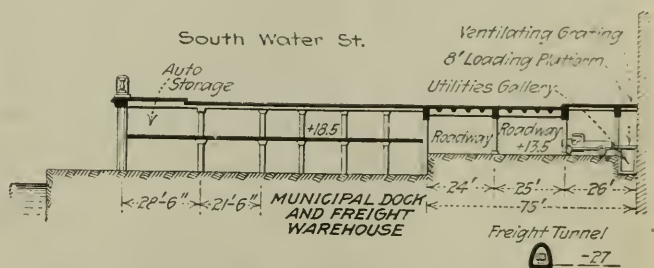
TRIPLE DECK PLAN GIVES PARKING SPACE
